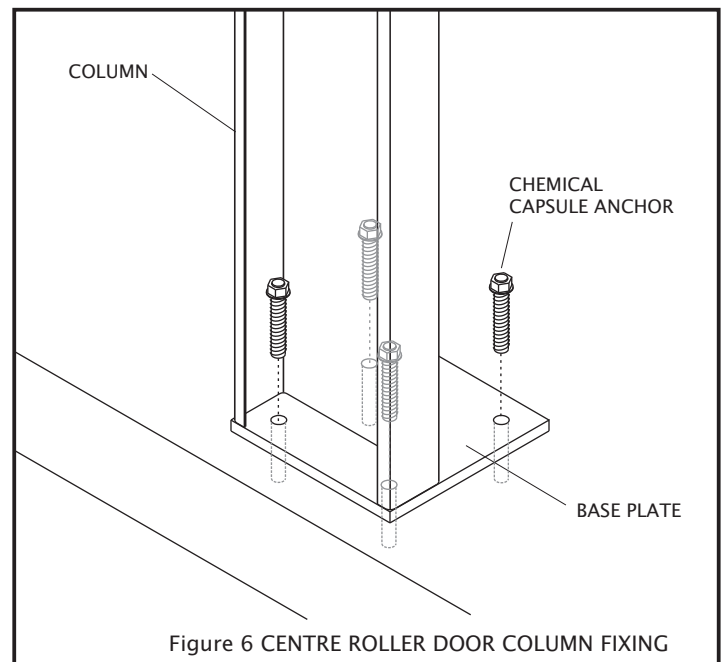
CENTRE ROLLER DOOR COLUMN FIXING
